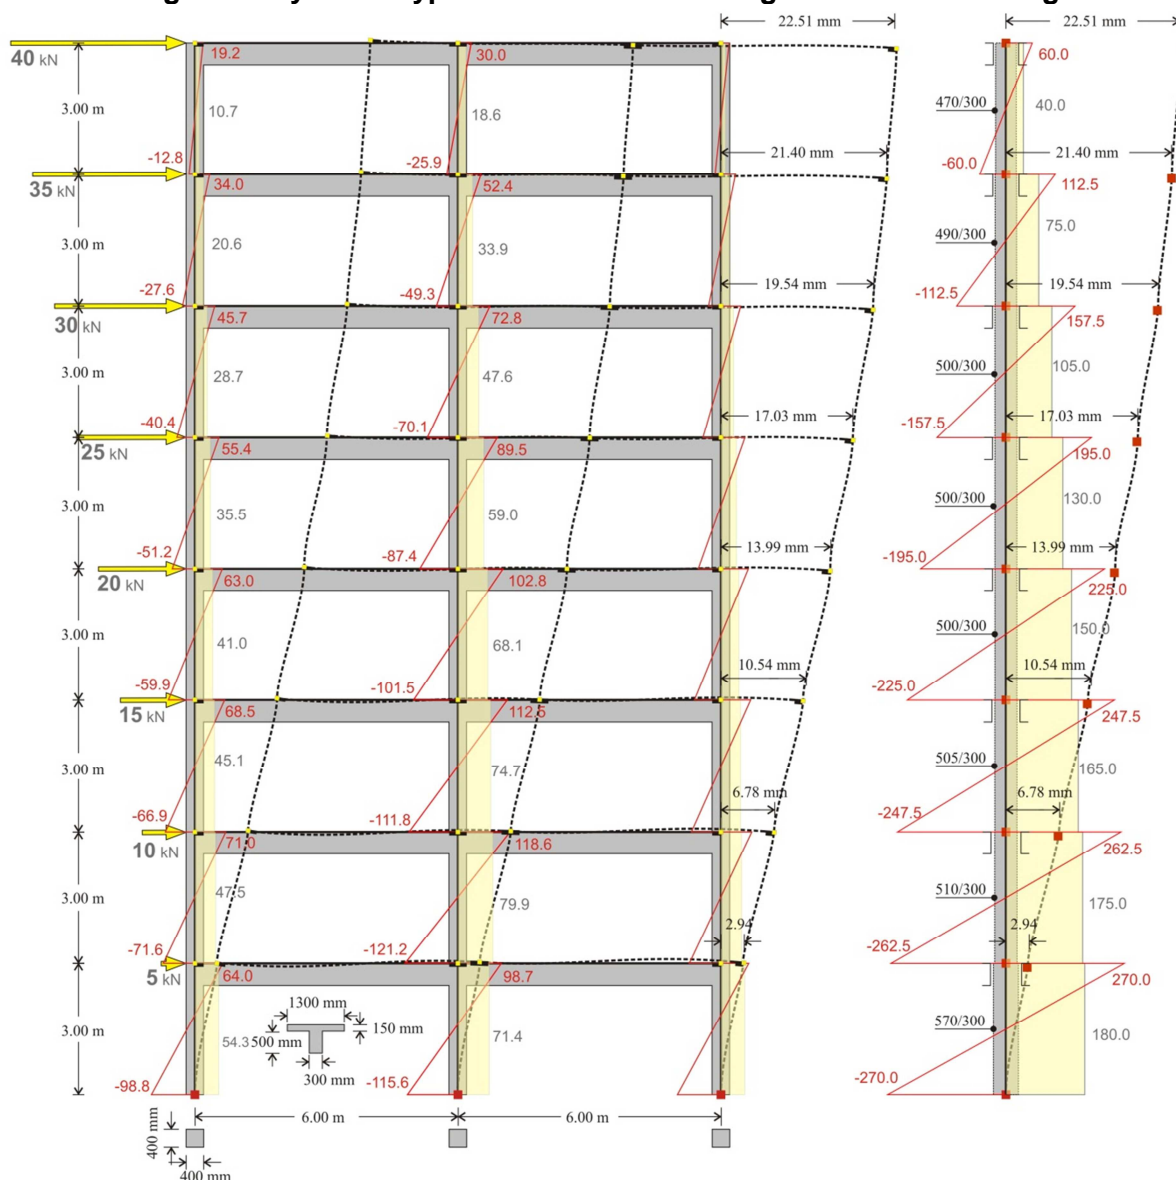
FRAME type structure comprising three column with cross-section 400/400
